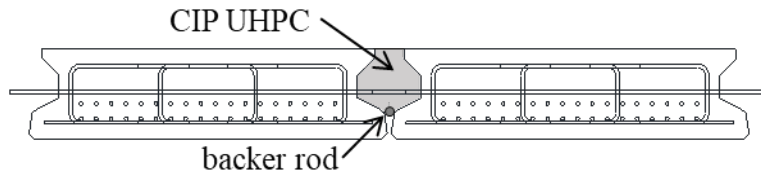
Construction of bridge with backer rods and CIP UHPC (like current FSB construction procedure).
